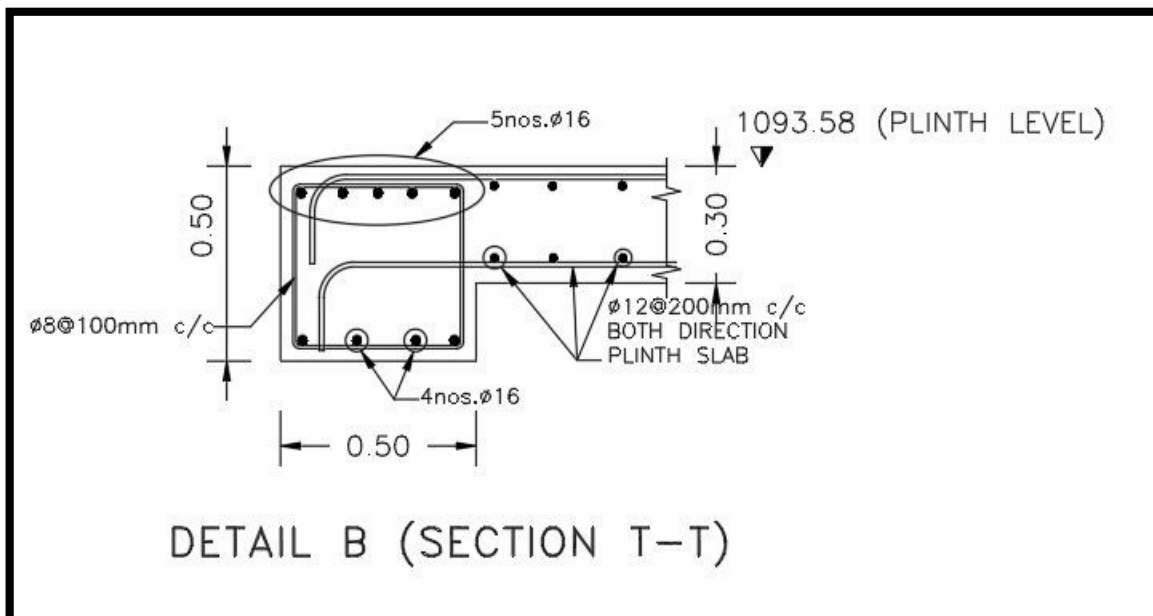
50 Detail B at section T-T of crane column and plinth level beam intersection
